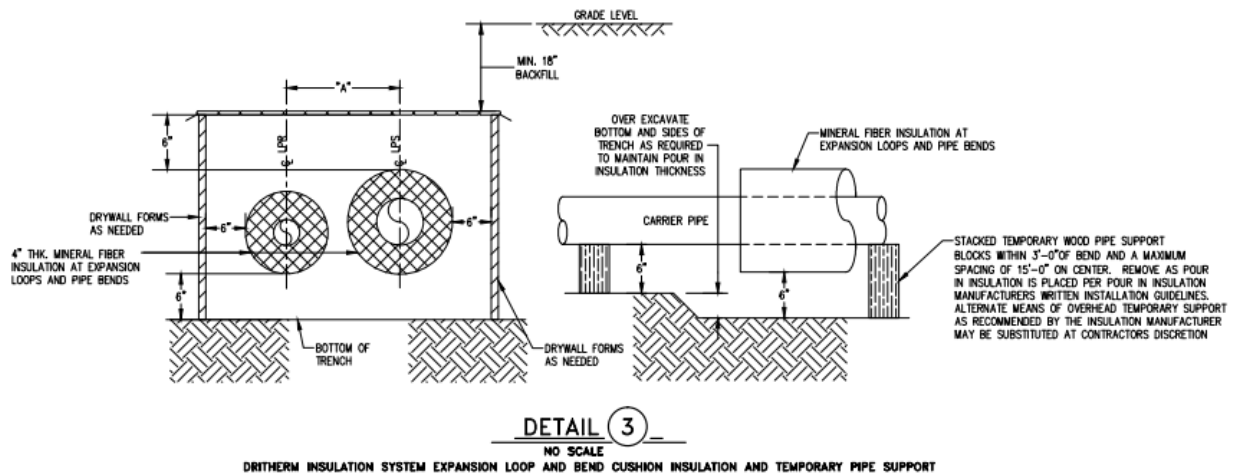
Field IRT test pipe installation details (Source: WVU Facilities Management)
